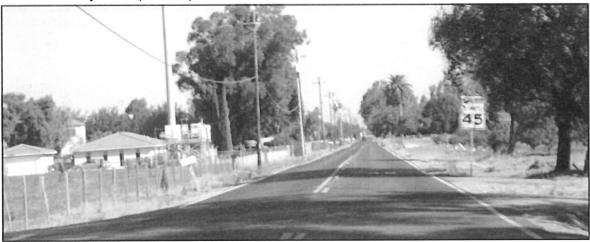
Naglee Road (looking north) at Middle Road (Lum, 9/16/22)
